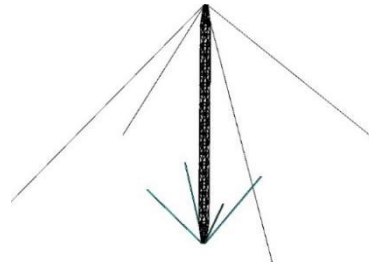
Nodal model of riveted aluminium alloy holding pole
